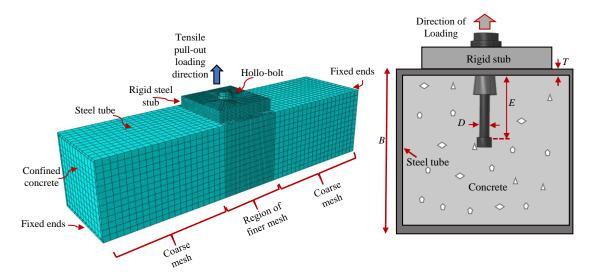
FE model of the single hollo-bolted connection and cross-section components.
